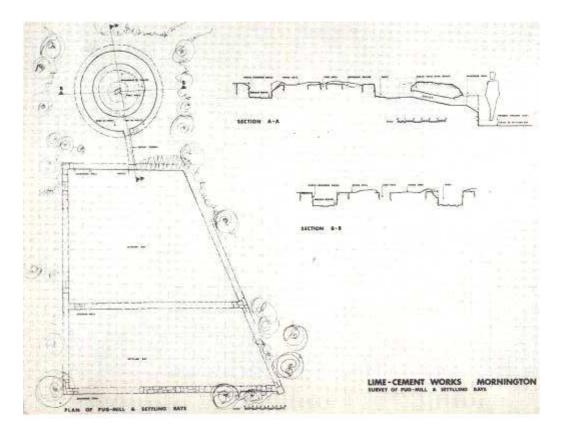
Plan of excavated Washmill - Culican and Taylor Plate VII p.39
